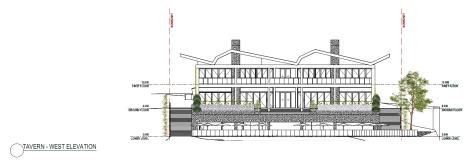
Western Elevation. Source: EJE Architecture June 2022
